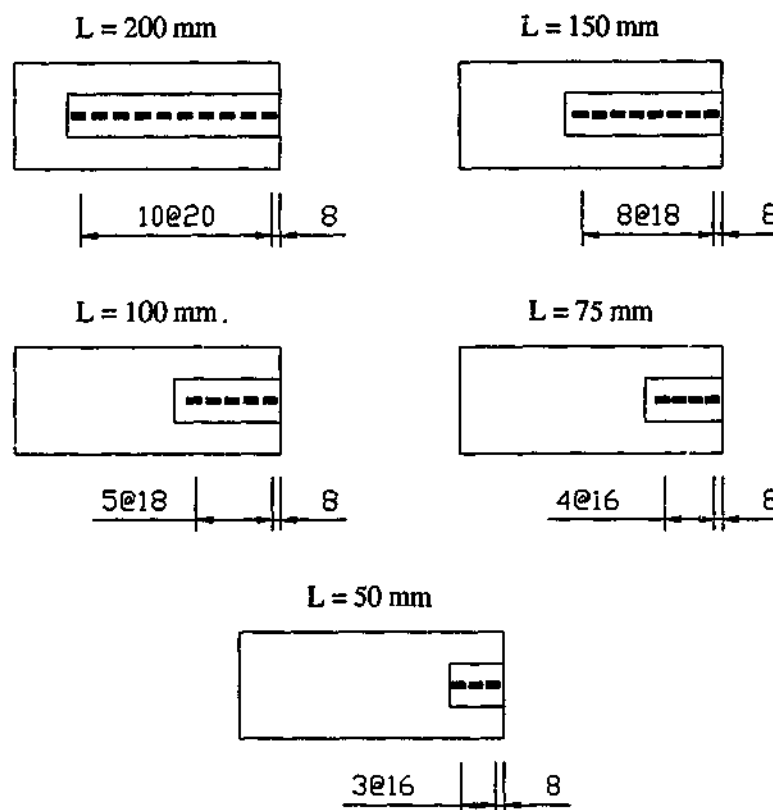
Locations of strain gauges on CFRP-concrete bond specimen
